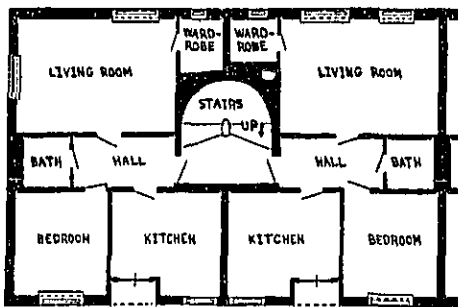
Plan showing layout of rooms in one end of an apartment house, Finnholia, Nacka, Sweden, planned for quiet living.
